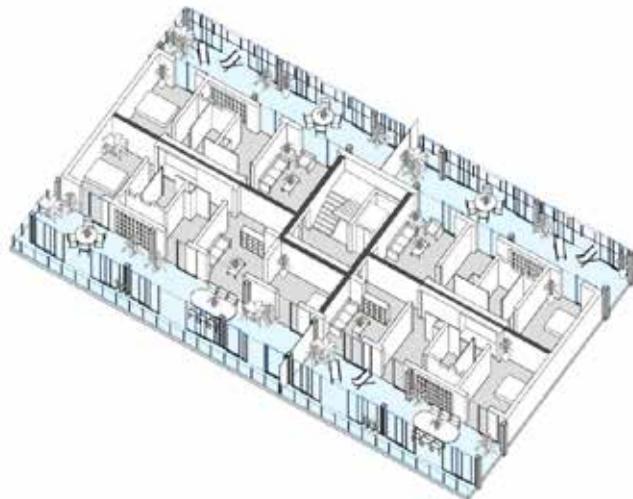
IMAGE: LACATON & VASSAL. PROPOSAL PLAN
